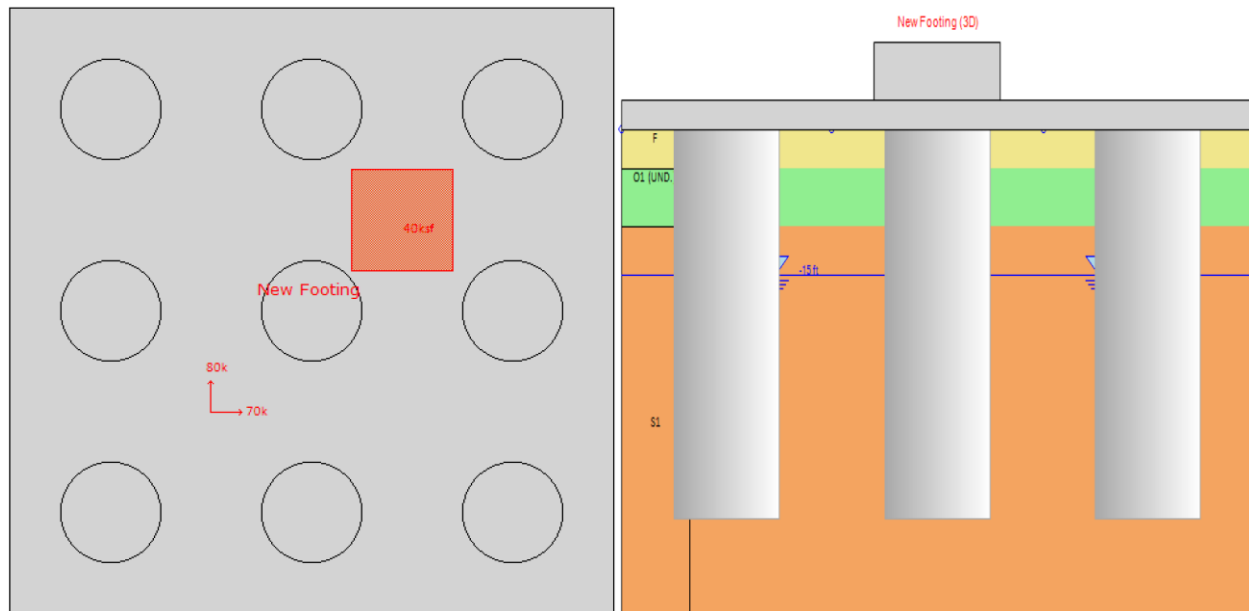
Pile Cap Wizard: Define piles layout.
